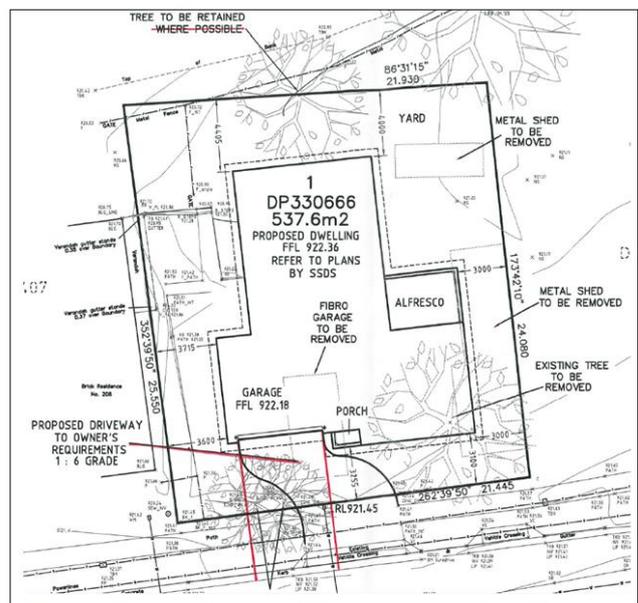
Site Plan of Proposed Dwelling House – Lot 1 DP 330666 – 208 Inch Street LITHGOW NSW 2790
